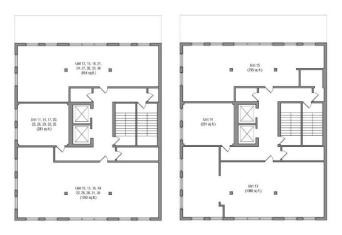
, 237 (left to right, top down): Building 8, fifth floor (1926); same floor (1981). 1'' = 32'. North is to the left.
